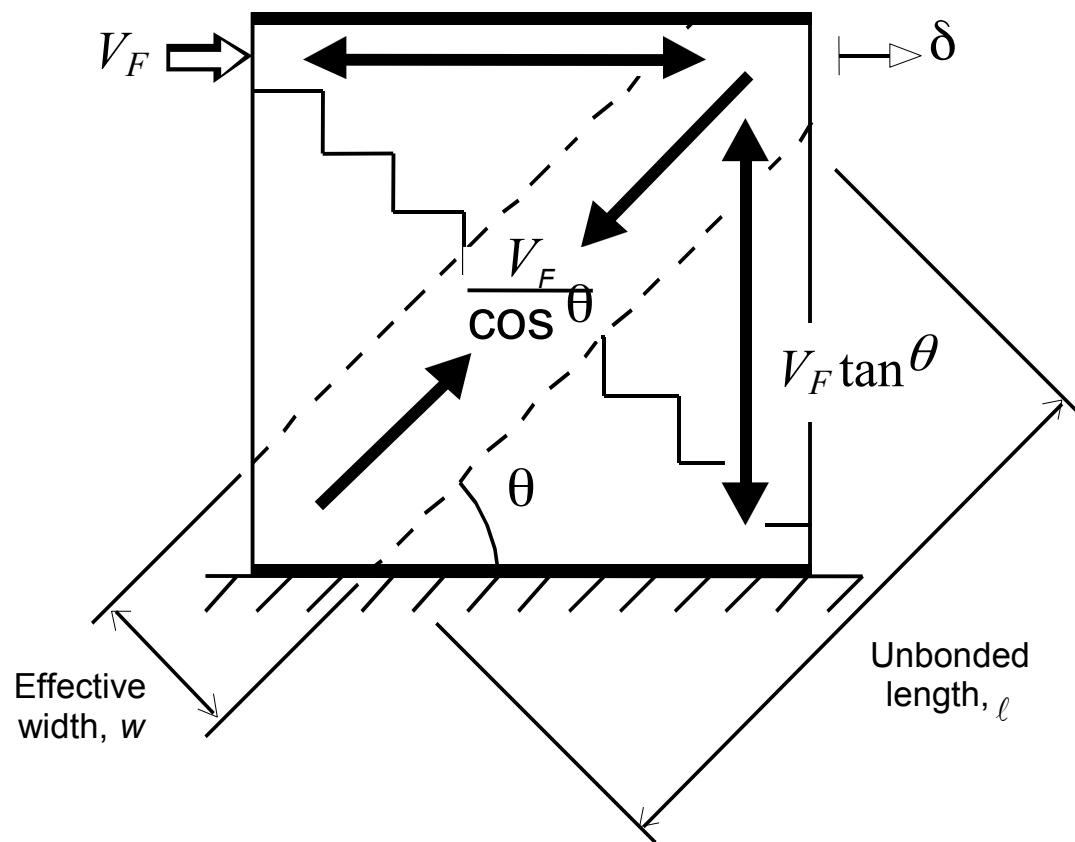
Truss mechanism for carrying load through the de-bonded strengthening.
